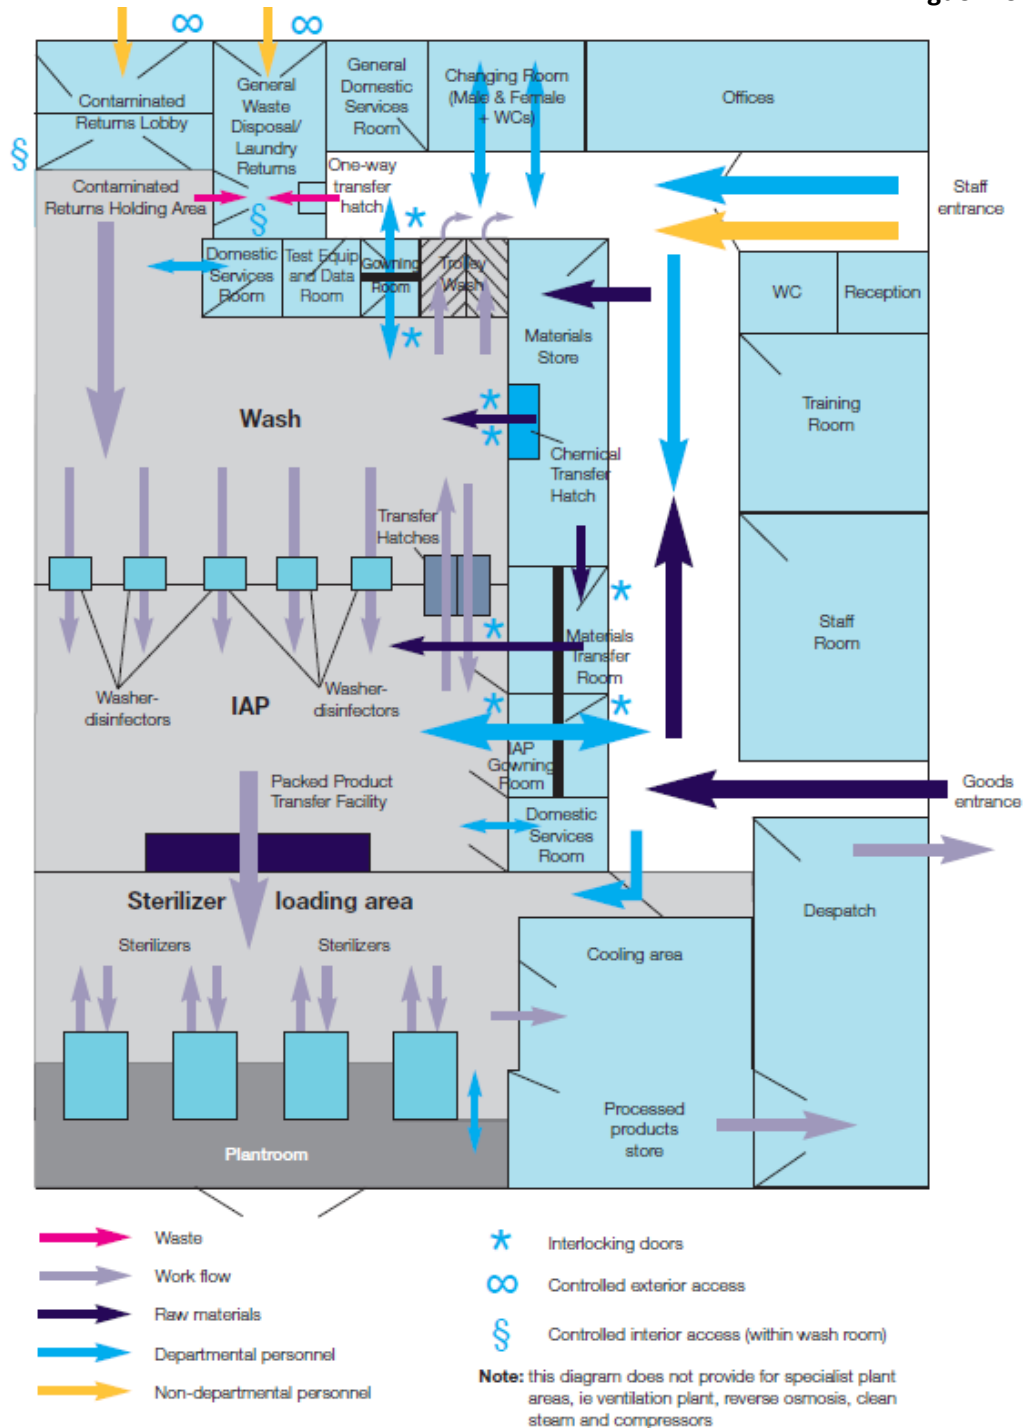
Single door sterilizer room layout, adapted from HTM standards.
